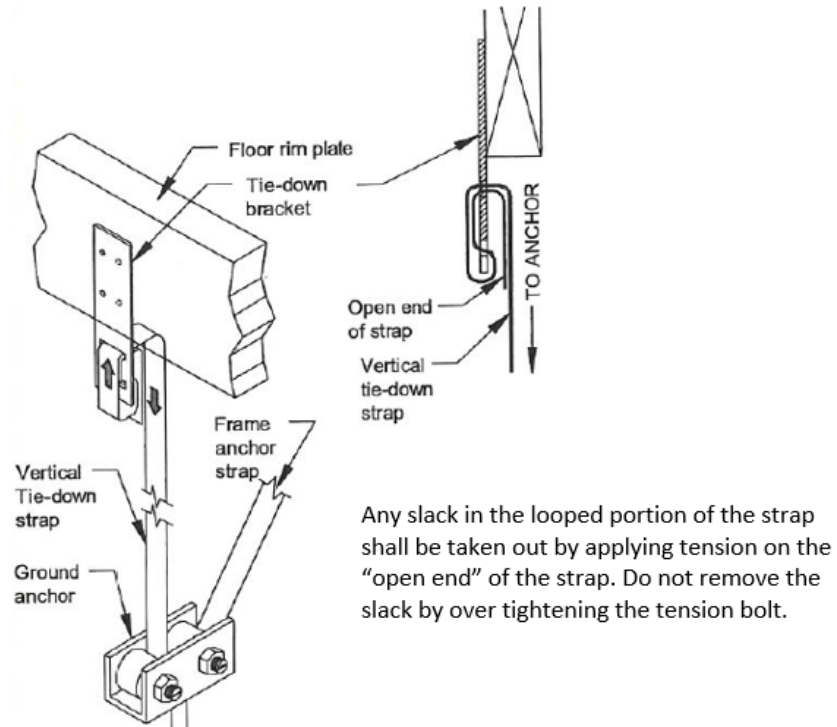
Alternate (looped) method for installing anchor straps in vertical sidewall brackets.
